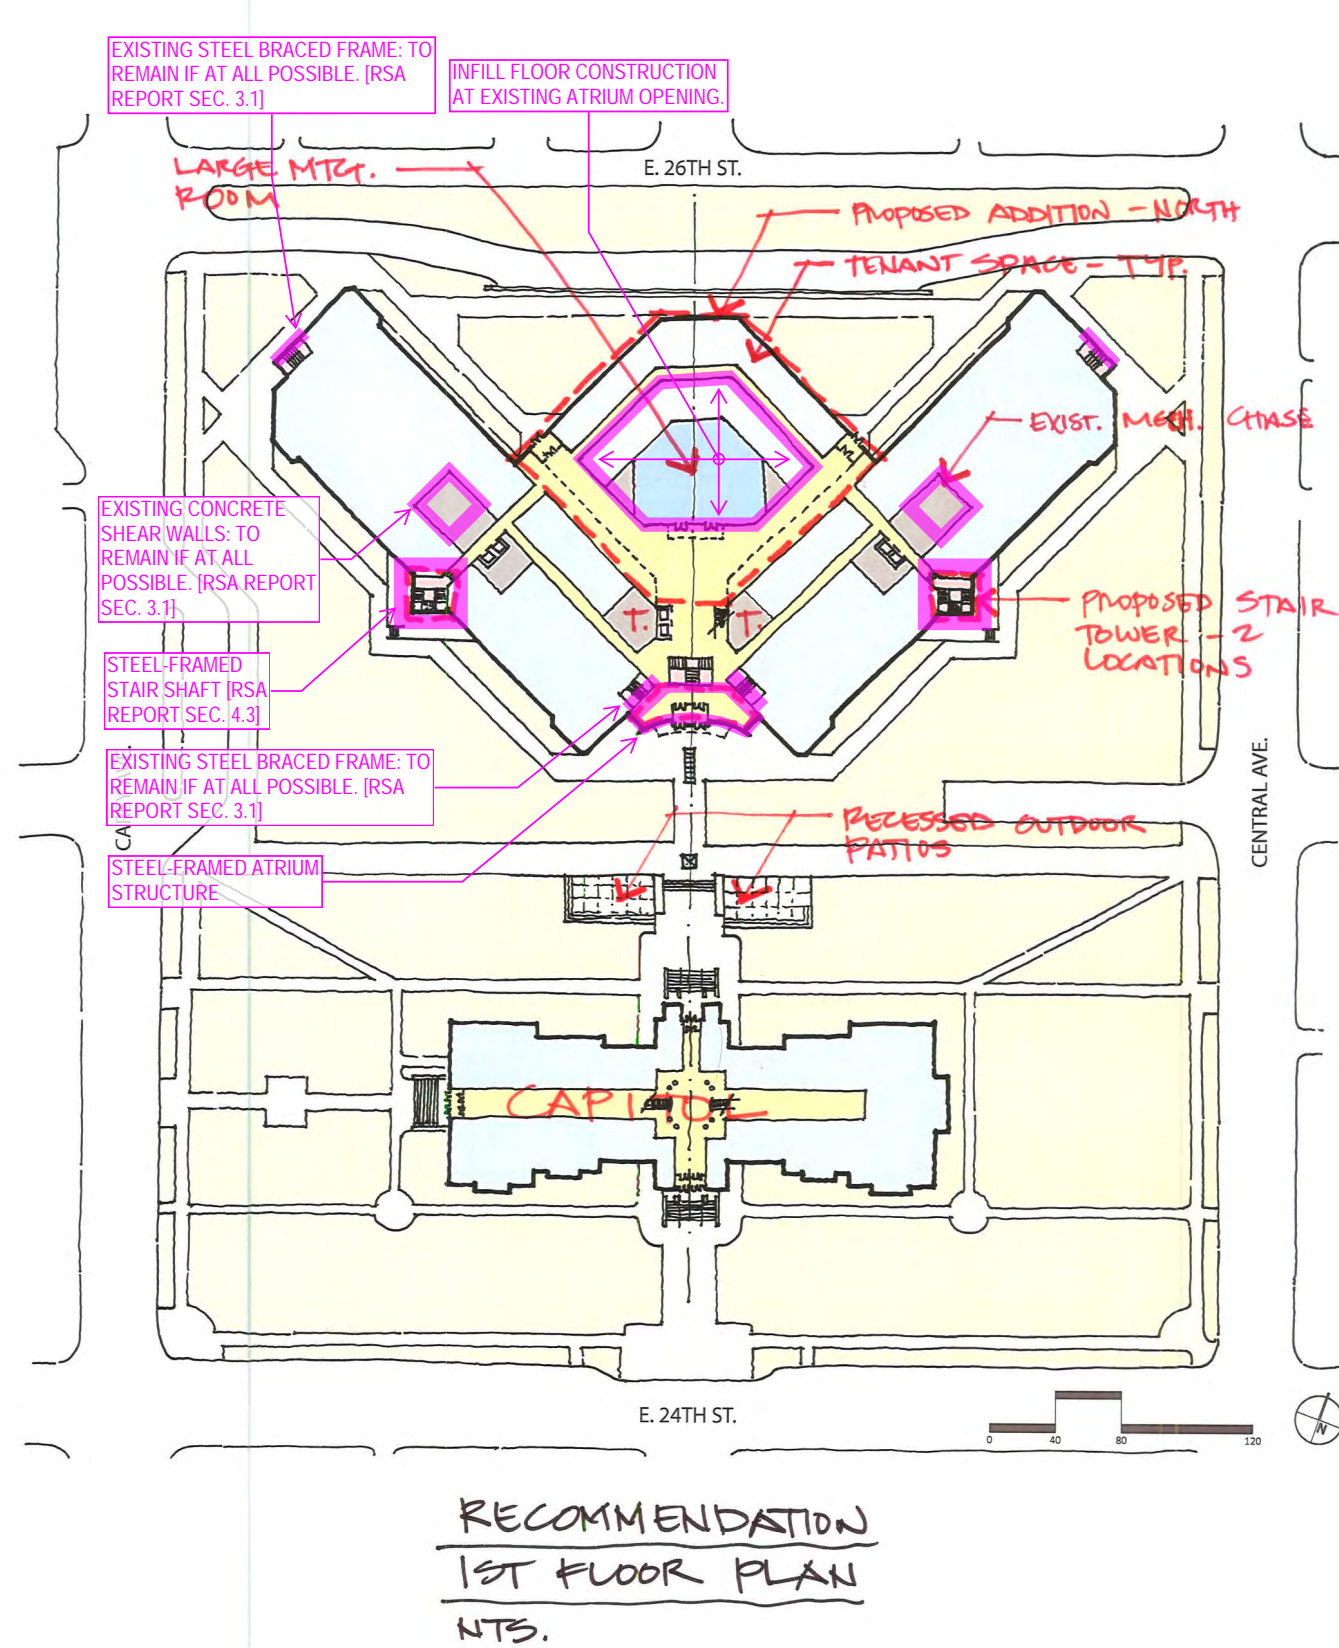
Recommendation Scheme Structural Markups – 1st Floor Plan
